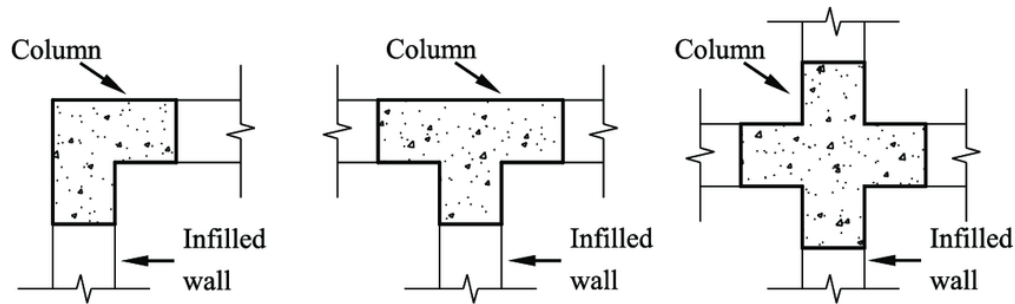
L- Shape, T- Shape, and Cross - Shape Columns[16].
